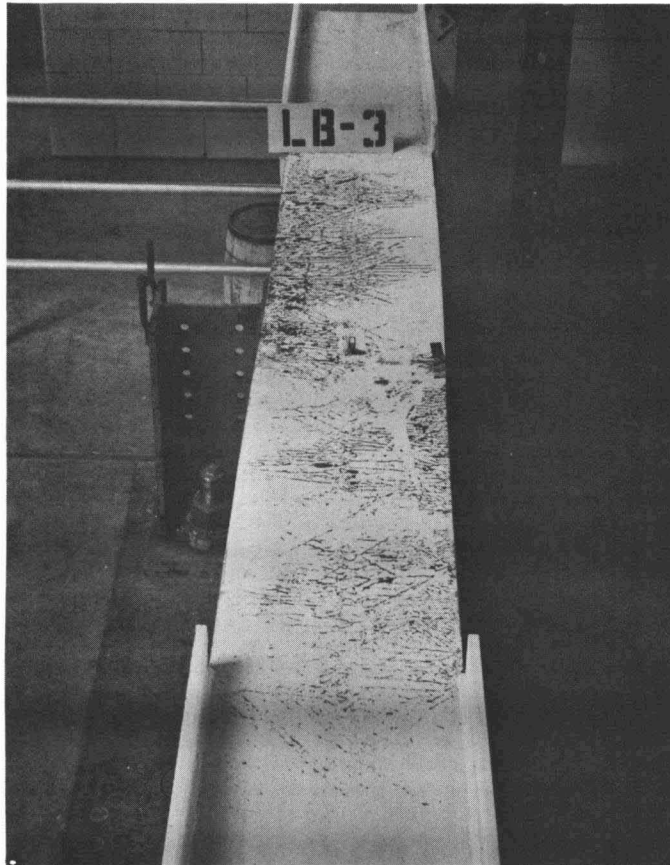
Yield Pattern on Top Surface of Compression Flange (Specimen LB3)
